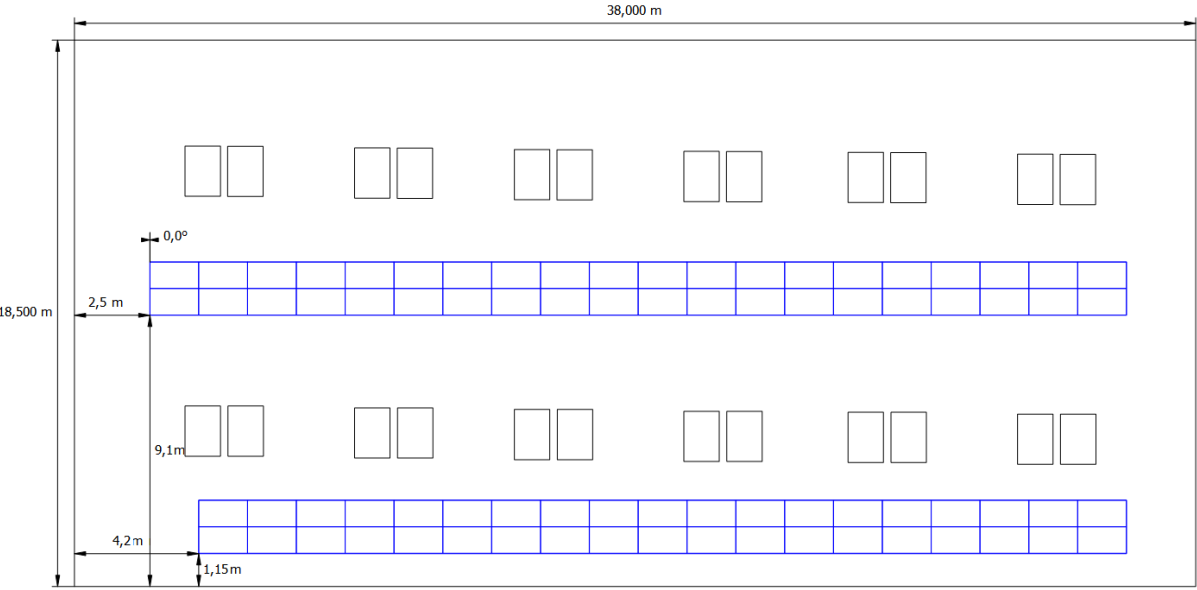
Top view with dimensions of the PV system optimized for FIT
